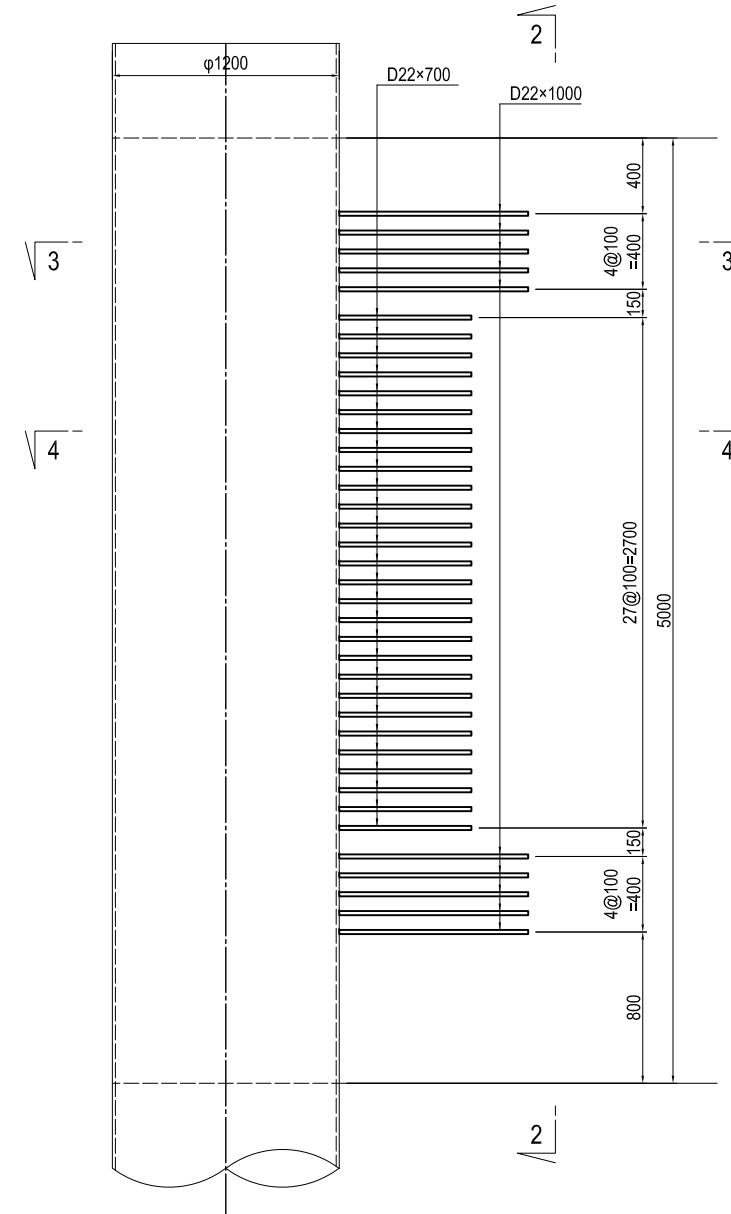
DETAIL OF CONNECTION BETWEEN STEEL PIPE SHEET PILE AND FOOTING OF P11 PIER
